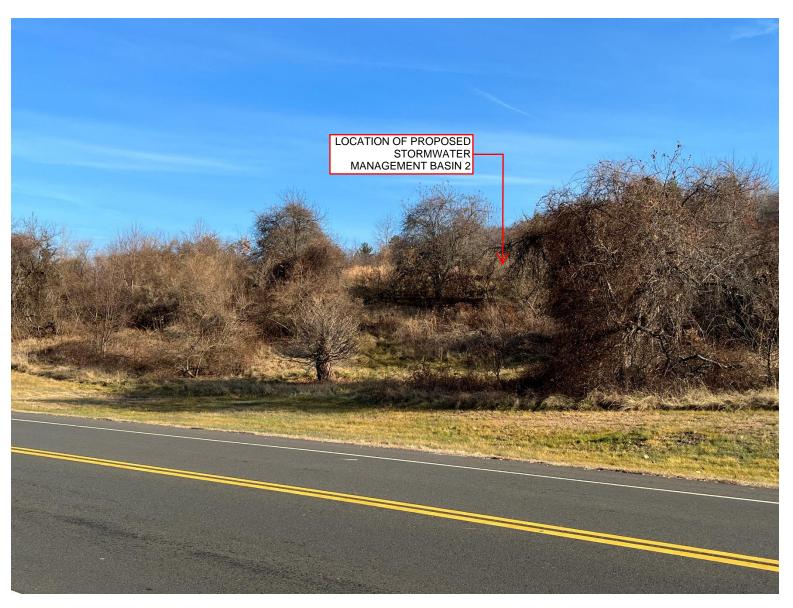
VIEW OF PROPOSED STORMWATER MANAGEMENT BASIN 2 AREA FROM SOUTH ROAD
